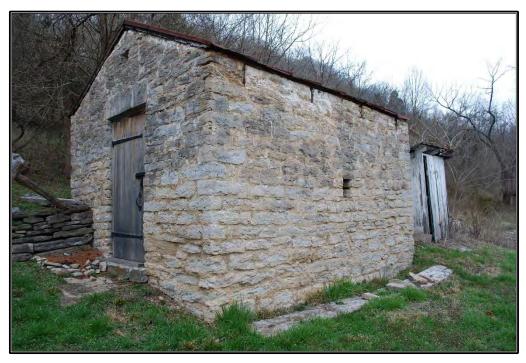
South and west elevations of smokehouse (Resource E), facing north.
